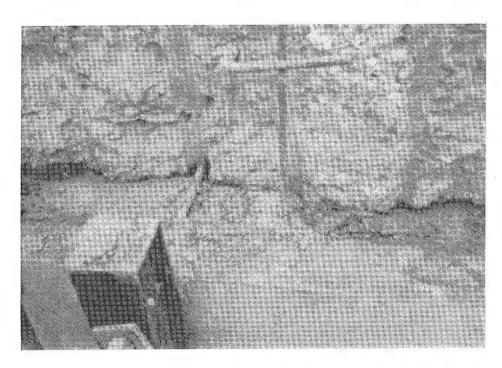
Top of precast panel following placement of infill concrete, Troy Lock (from Miles 1993)
